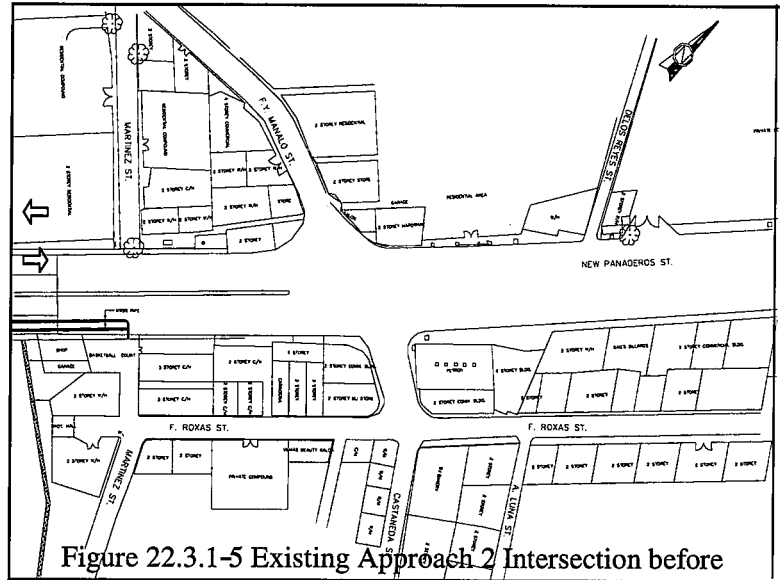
Existing Approach 2 Intersection before Improvement
